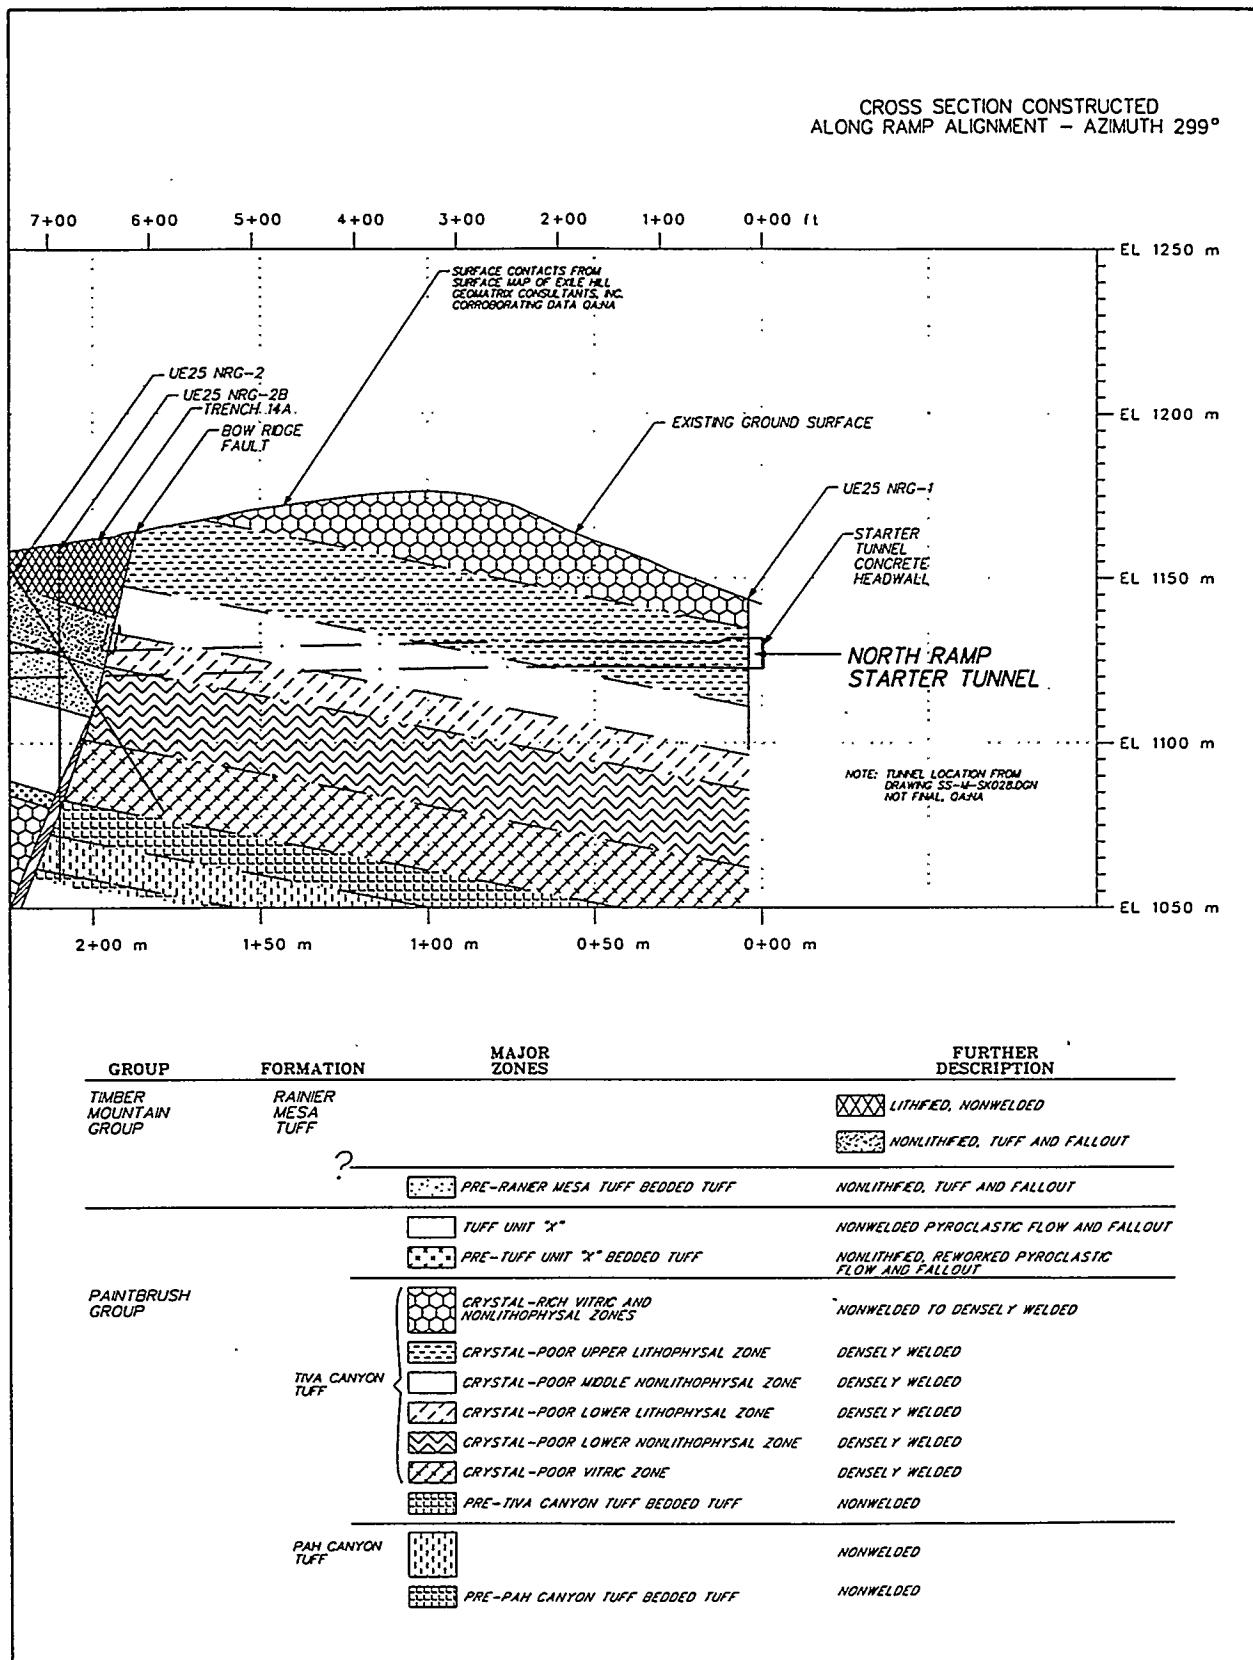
Cross section through Exile Hill showing the North Ramp Starter Tunnel.
